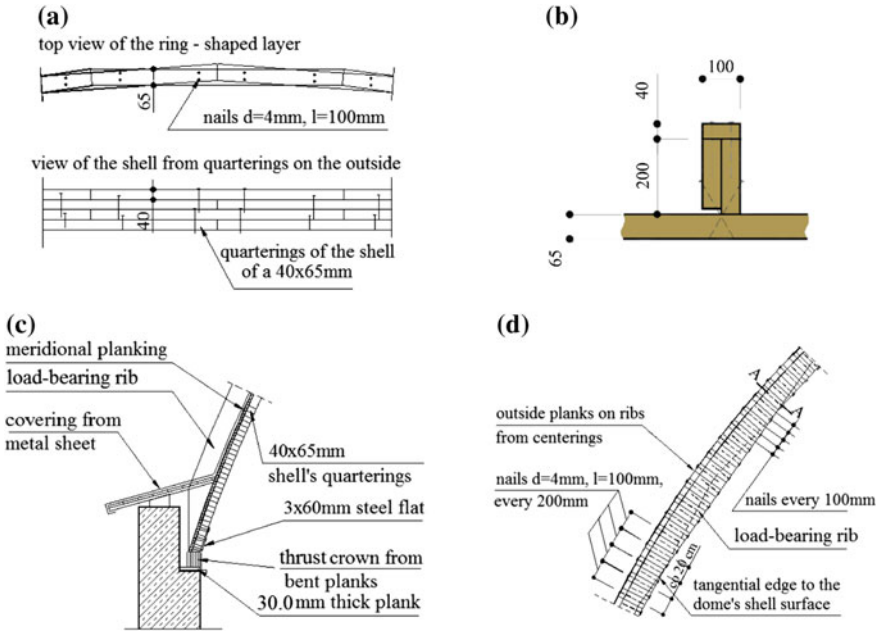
Thick-wall dome with outside ribs [16], a arrangement of the shell's quarterings 2, b section of an outside rib 1, c supporting crown, d structure of an outside rib 1
